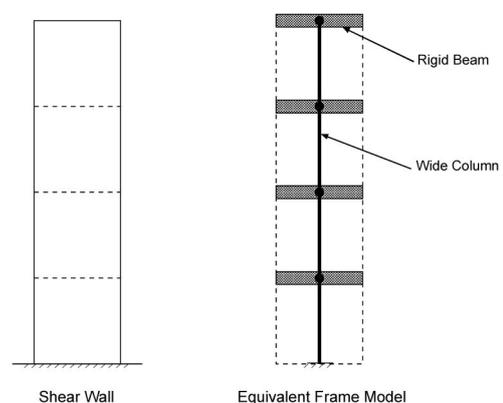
Equivalent Frame Model of a Planar Shear Wall
